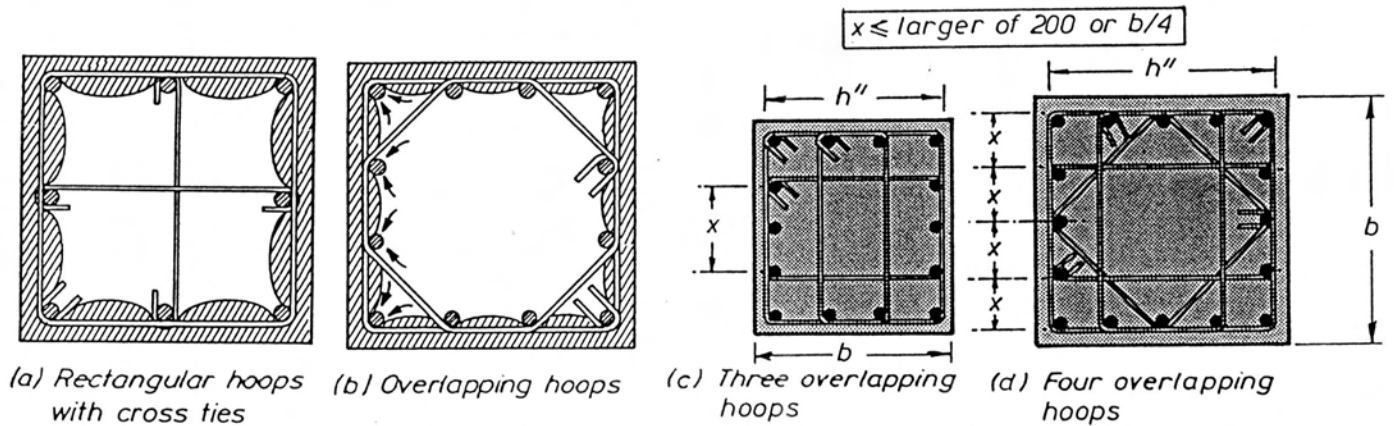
Typical overlapping hoops used to confine the concrete core in columns.
